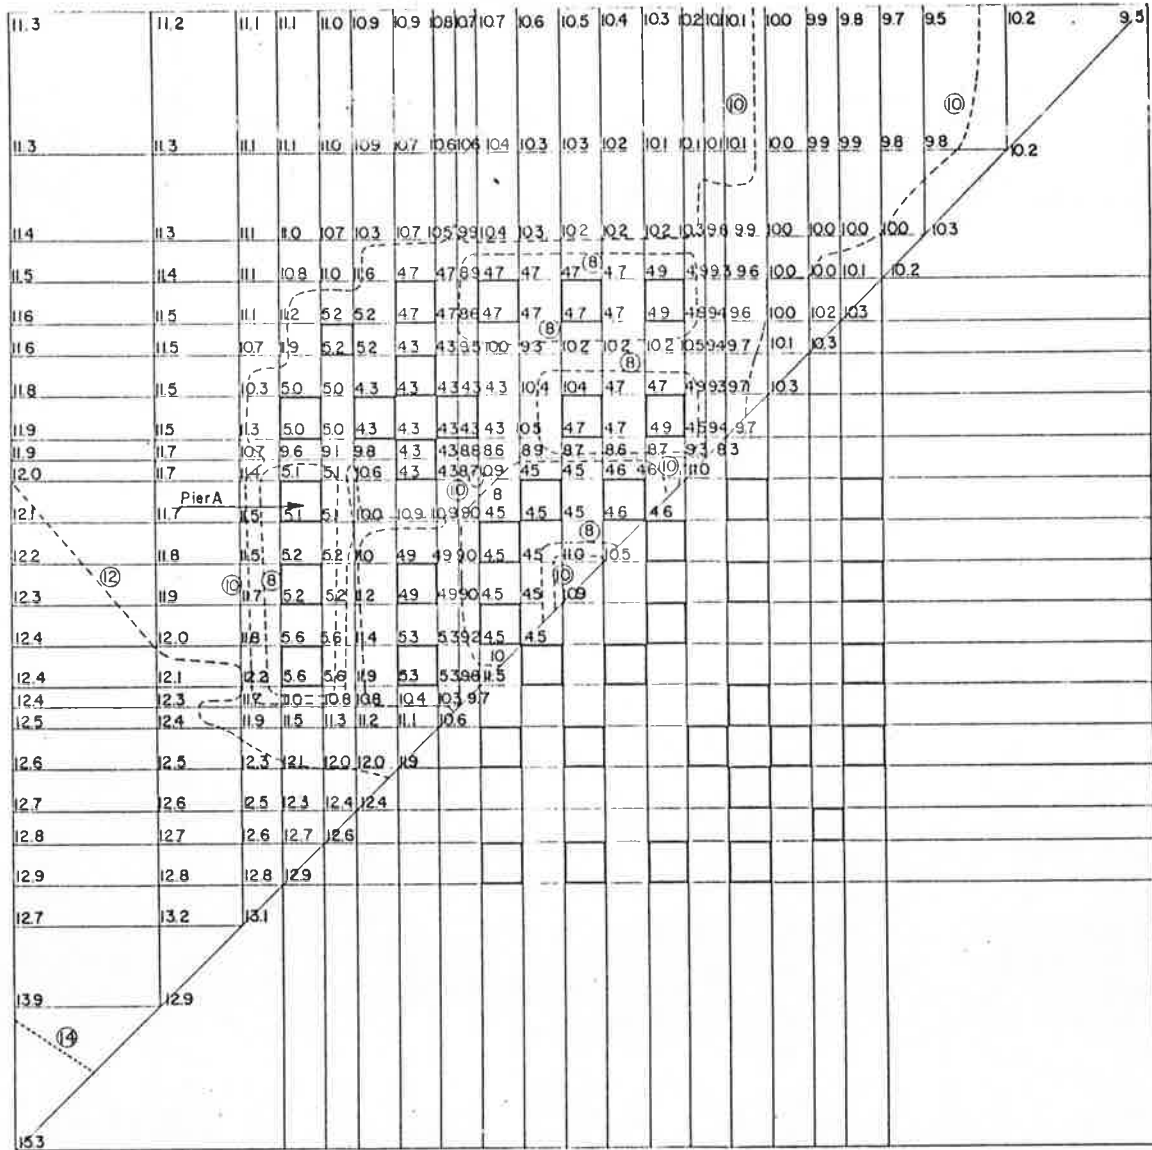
Vertical heaves of foundation and soil surface (cm), symmetric plan, discretization 5
